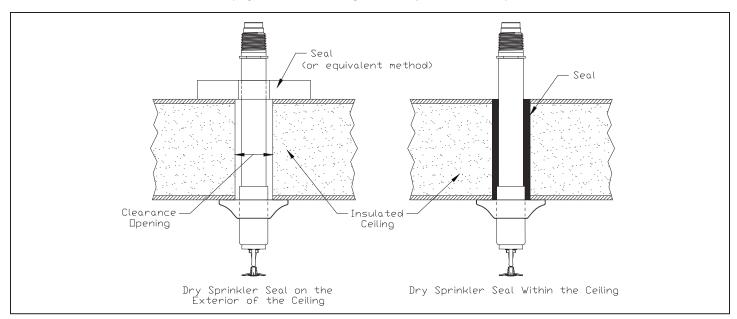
Dry Sprinkler Seal (Adjustable Standard Dry Pendent Sprinkler is Shown)
